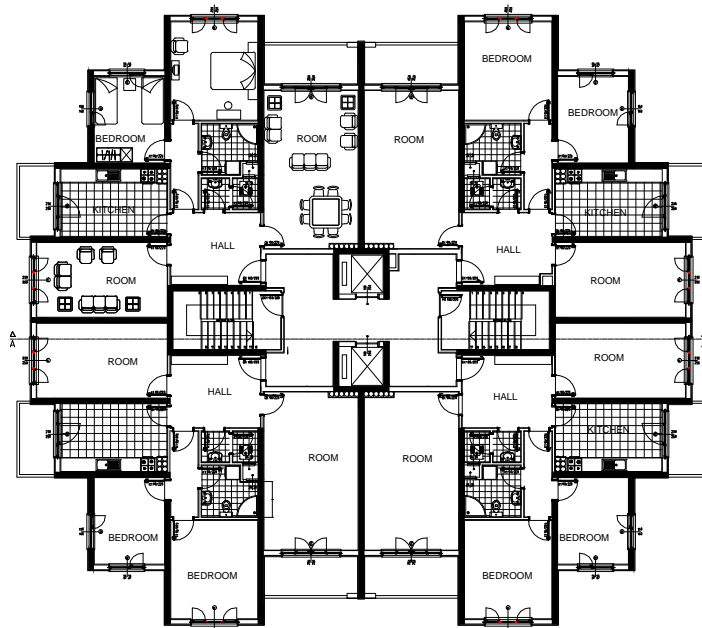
Standard floor plan of the 150 m<sup>2</sup> dwellings
